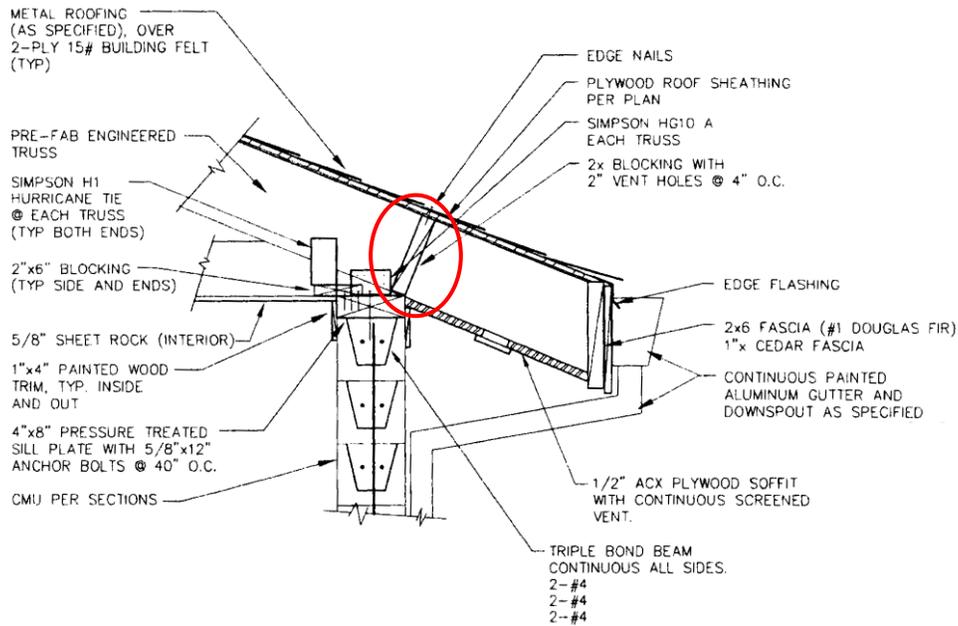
Inadequate Connection between Blocking and Masonry Wall Top Plate
